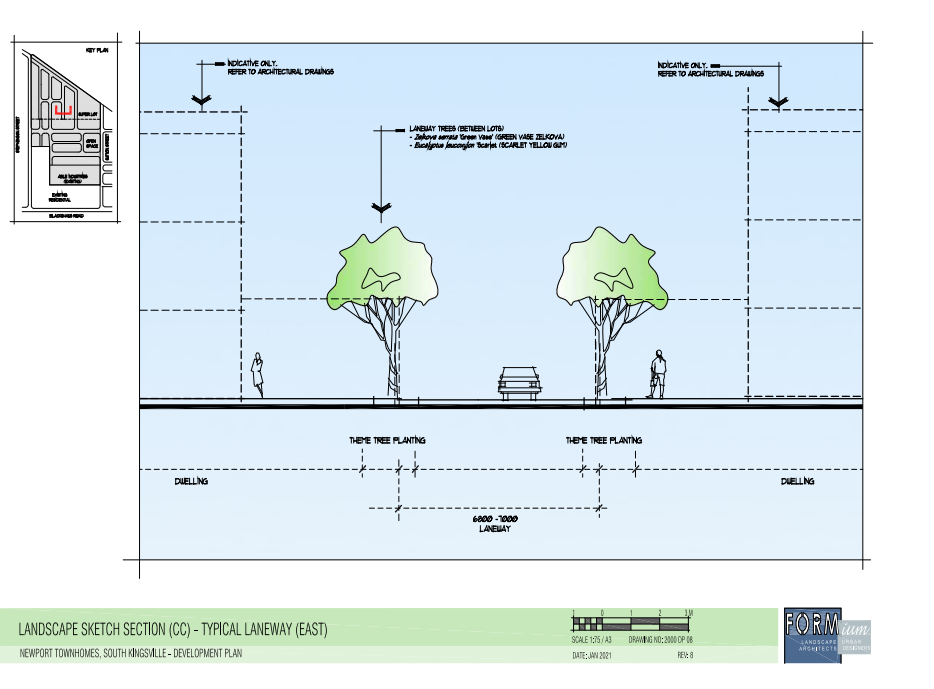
Indicative Typical Typical Laneway - east (Source: Formium)
